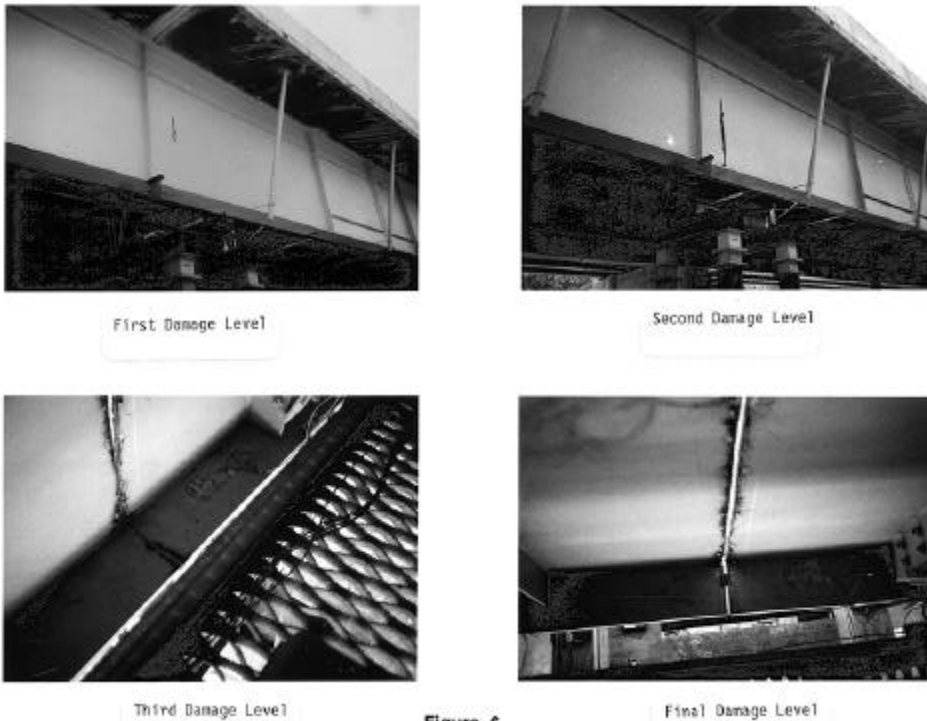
Damage Introduced into the plate girder of the bridge.
